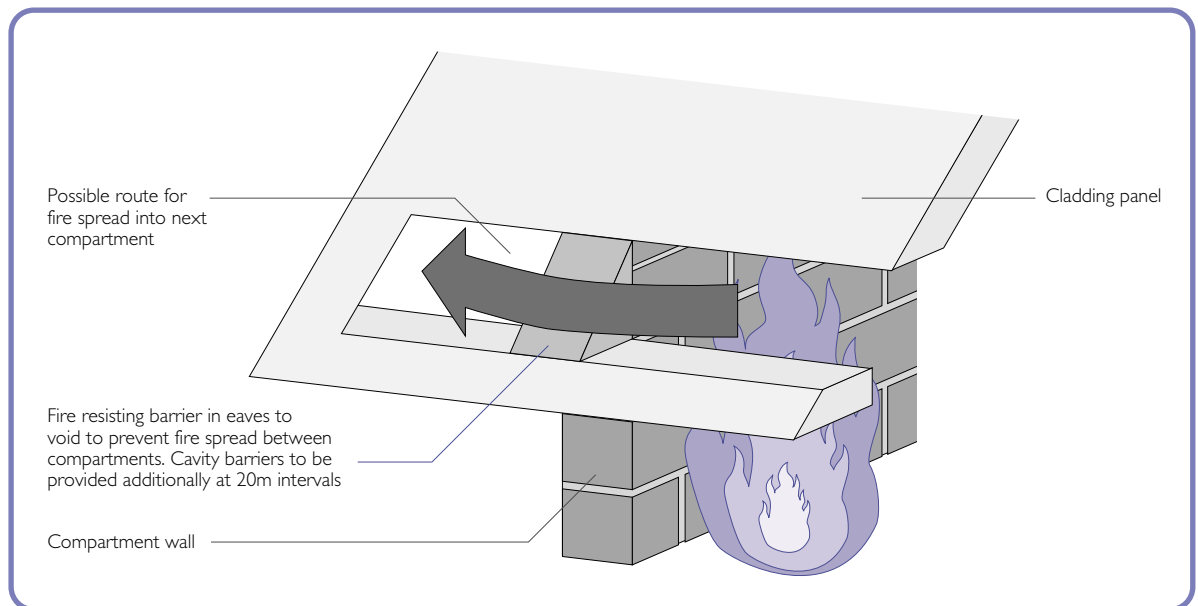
Illustration of required fire resisting barrier and cavity barrier at eaves
